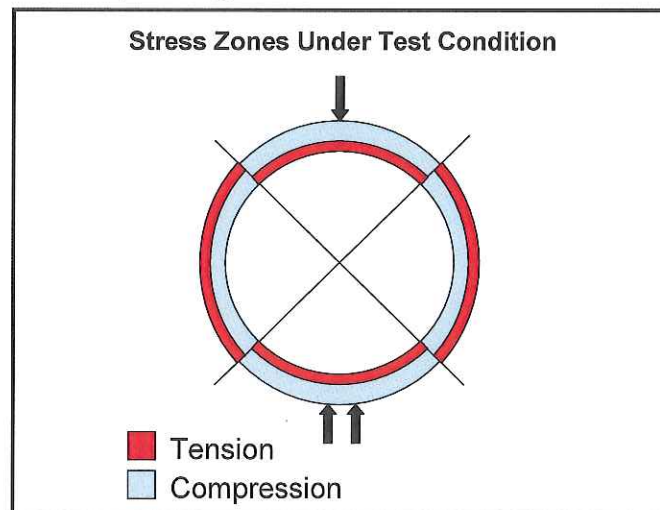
Zones of Tension and Compression in Reinforced Concrete Pipe during Three Edge Bearing Test (field conditions of installed pipe similar.)
